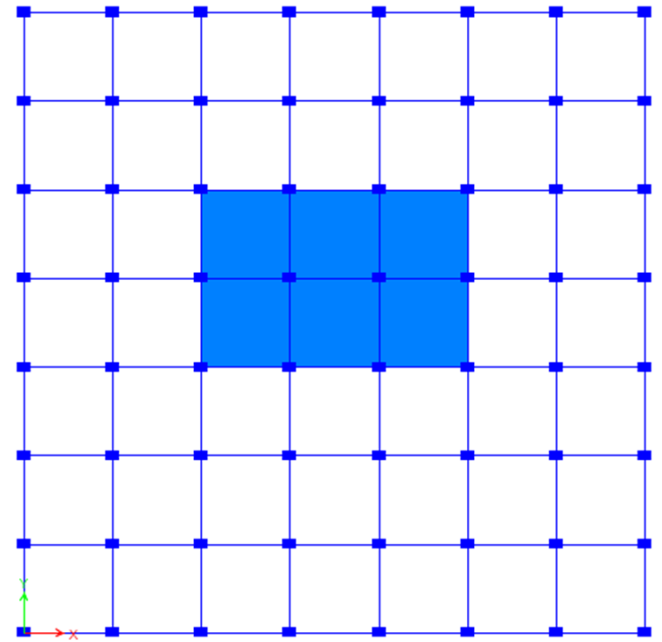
Location of swimming pool at 3rd and 6th floor in mass irregular building
